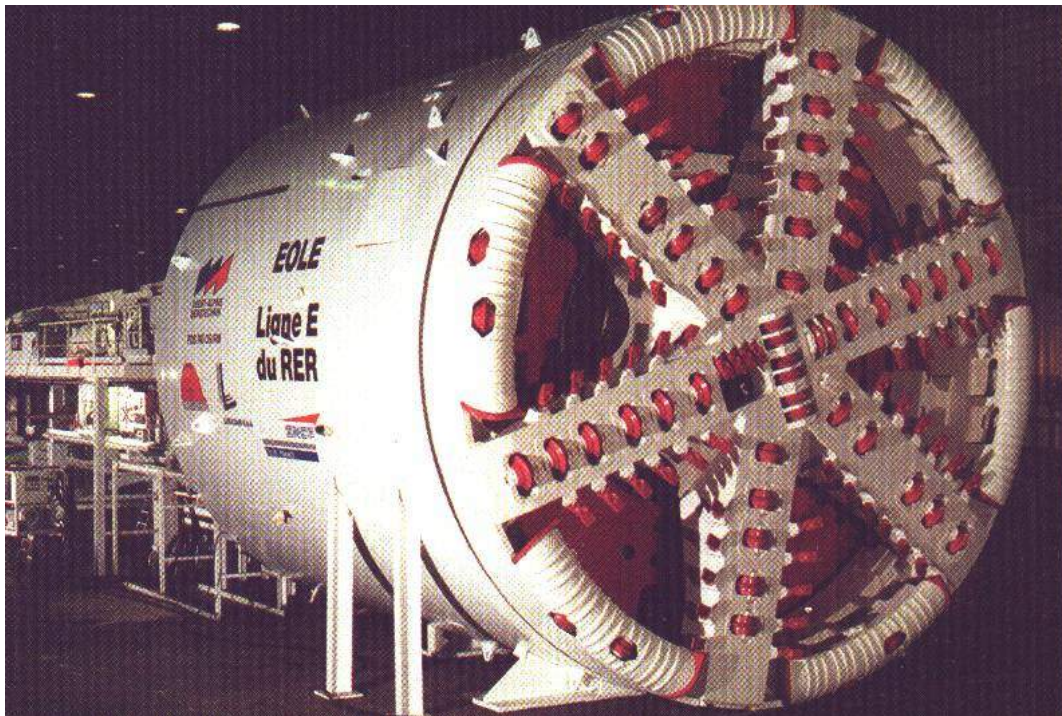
Rim-type cutting wheel with mixed disk cutters and drag bits. Diameter 7.4 m. Used for the connecting tunnel between two railway stations in Paris. (After Voest-Alpine Bergtechnik, Austria)
